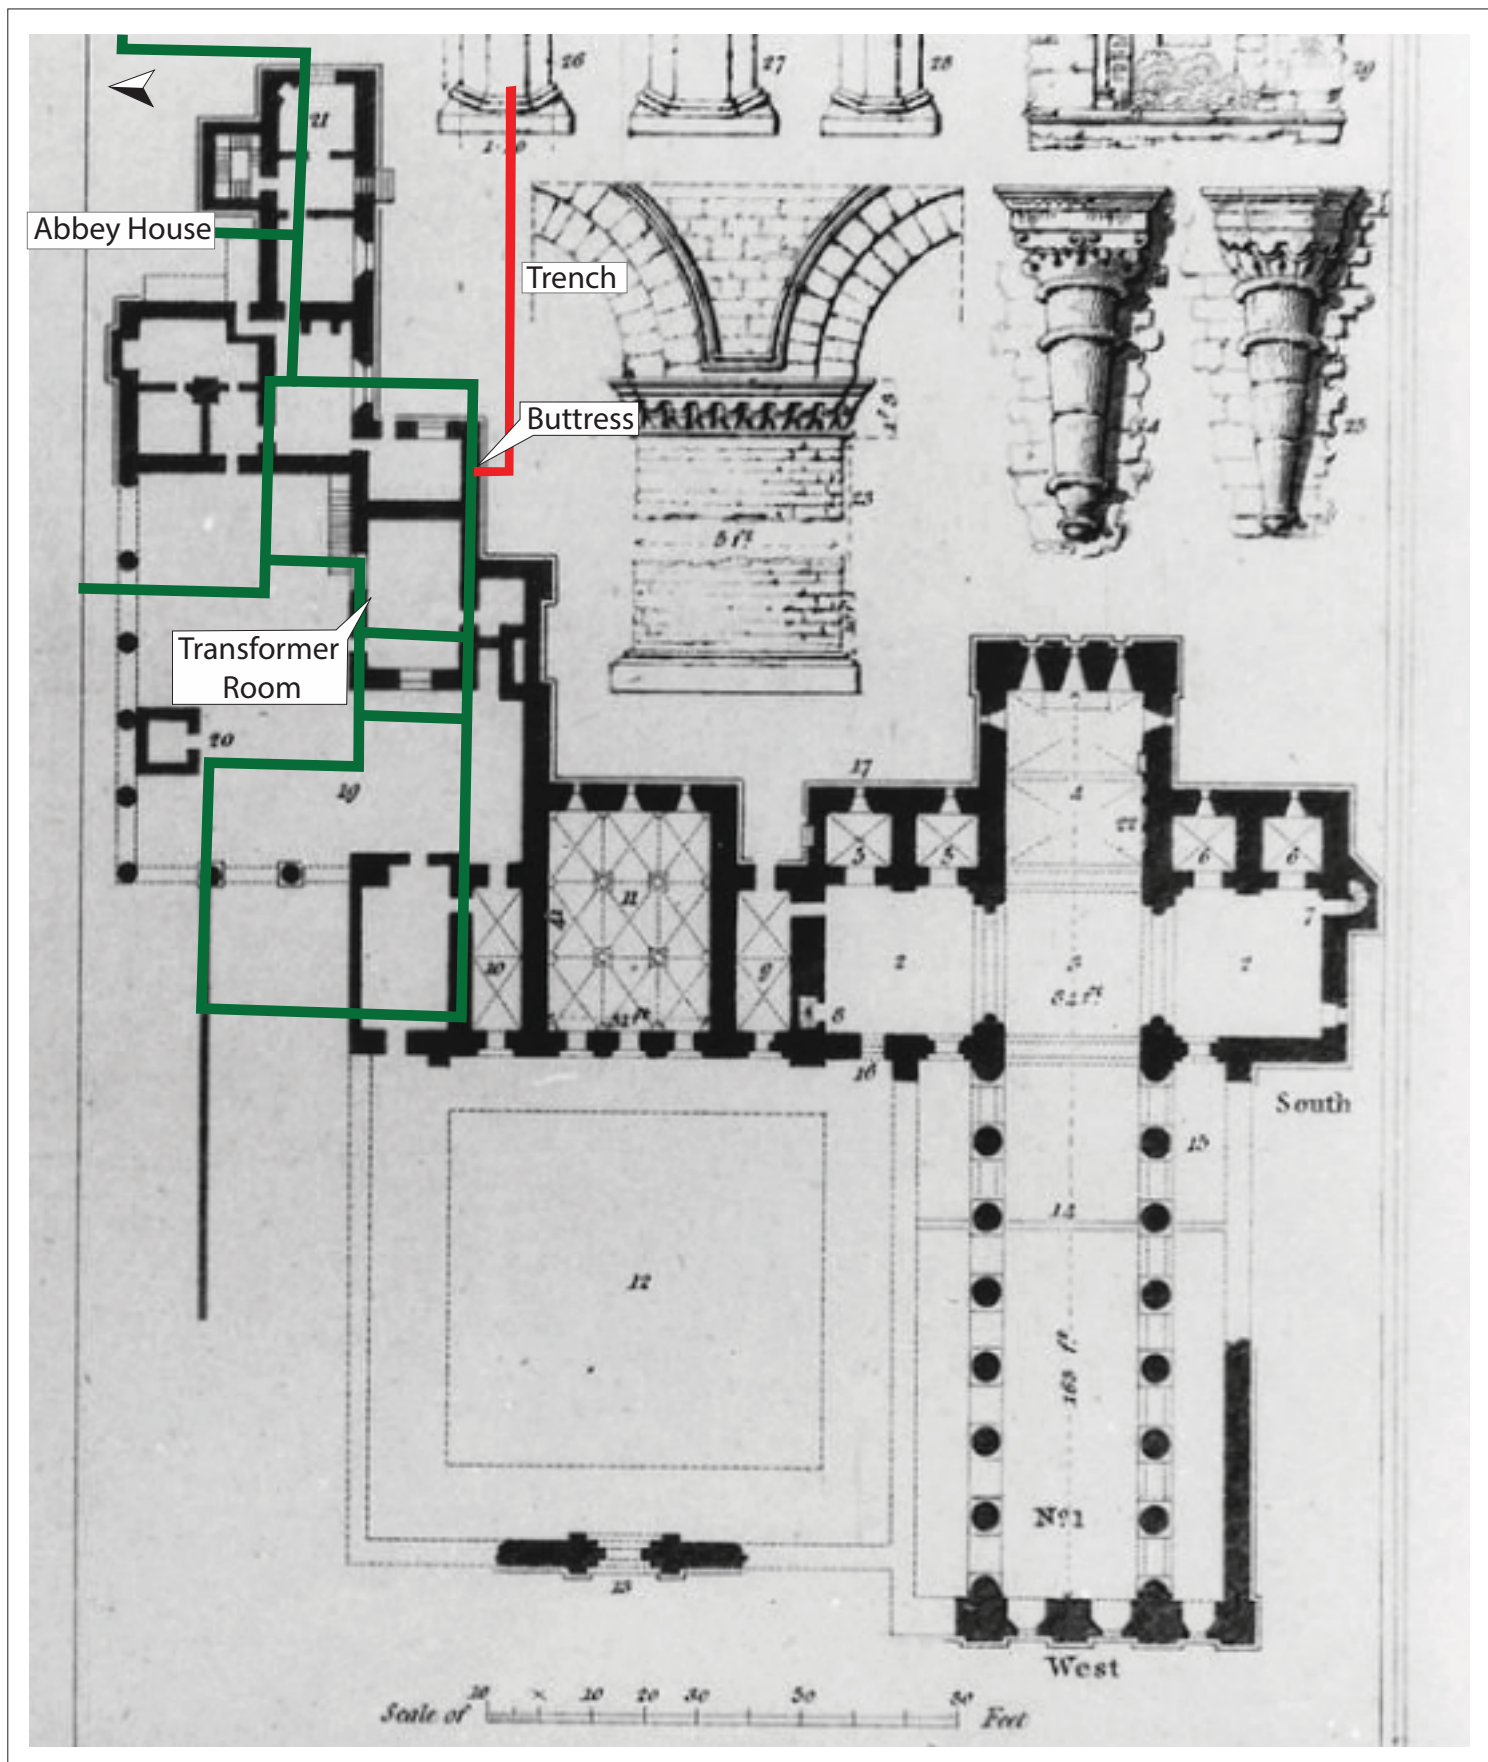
1813 Architectural plan by Edmund Aikin showing medieval layout of Buildwas Abbey with the approximate location of the WB trench (bright red), Abbey House and the Transformer Room building (green)
